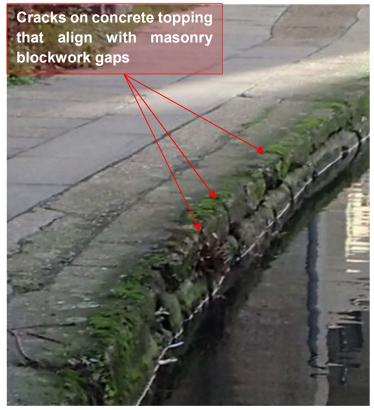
Cracks on concrete topping of Section 3
